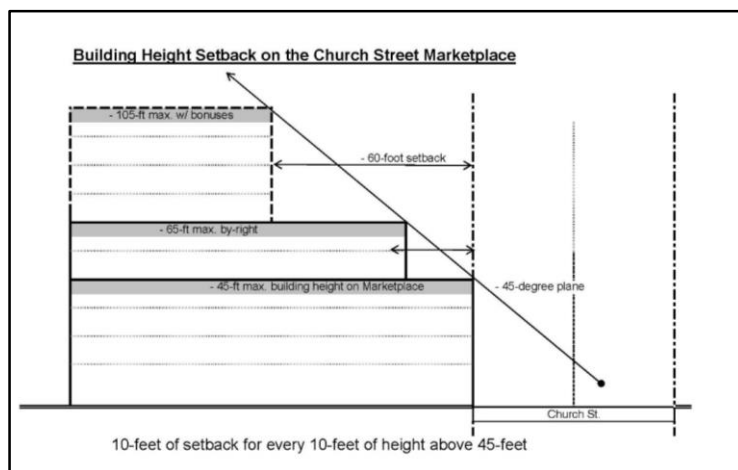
Measuring Height Limits for Church Street Buildings
